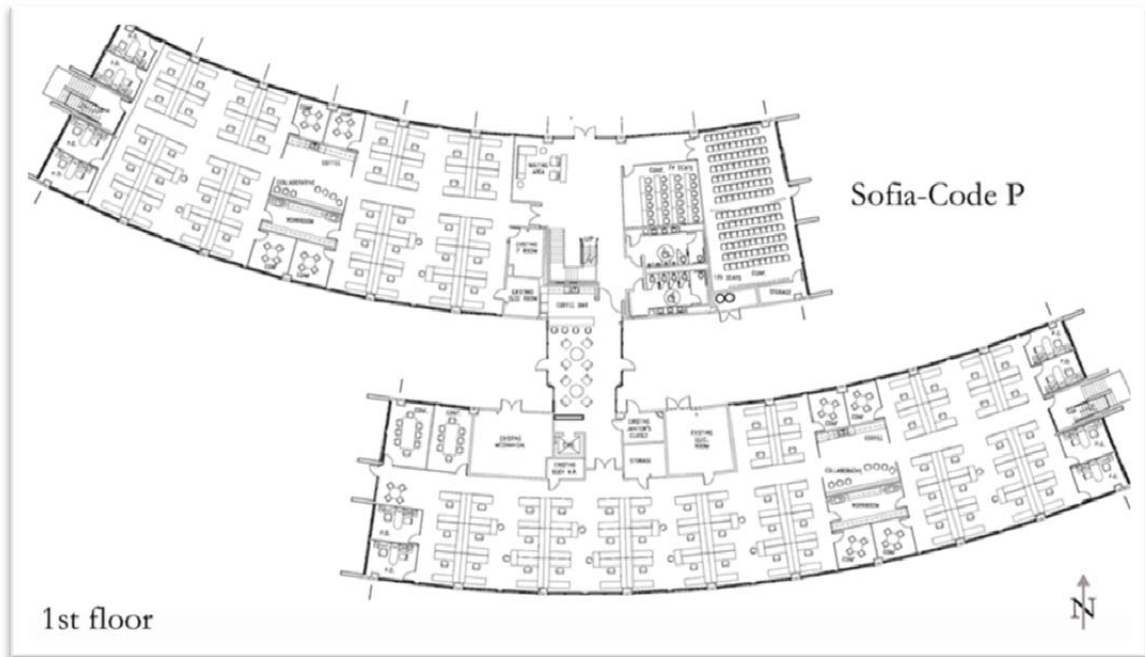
Layout: 1st floor open plan workspace layout for Sustainability Base; Schuler et al. 2010
